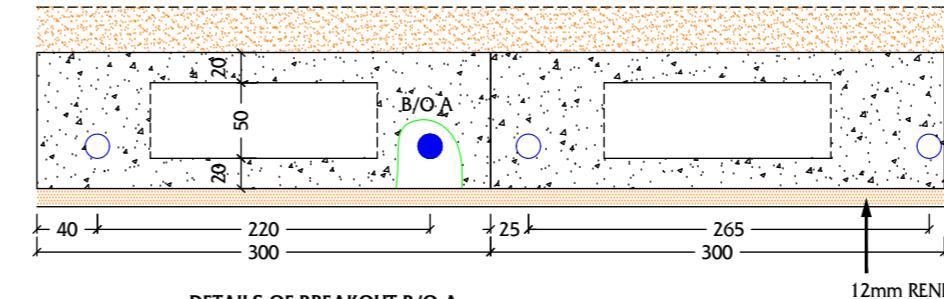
PART SECTION LOOKING SOUTH THROUGH 1ST FLOOR SLAB SHOWING
